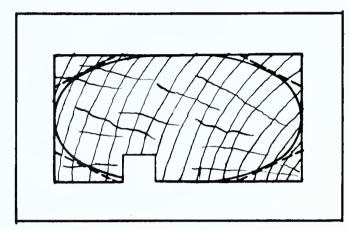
End View of a Piece of Wood to be Shaped for a Hand Rail
